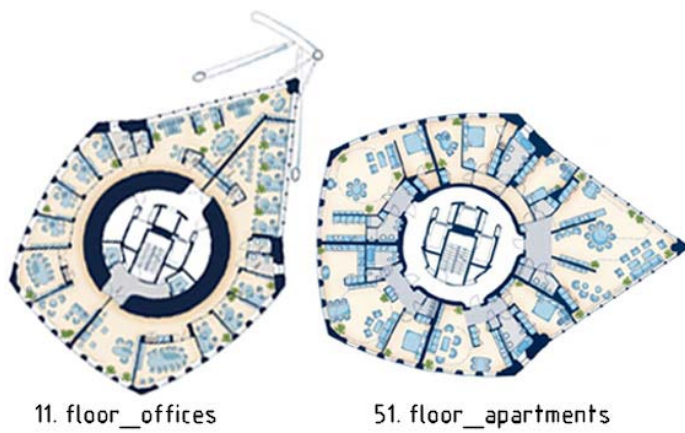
left: High Rise in Malmö \_ exemplary floor plans
